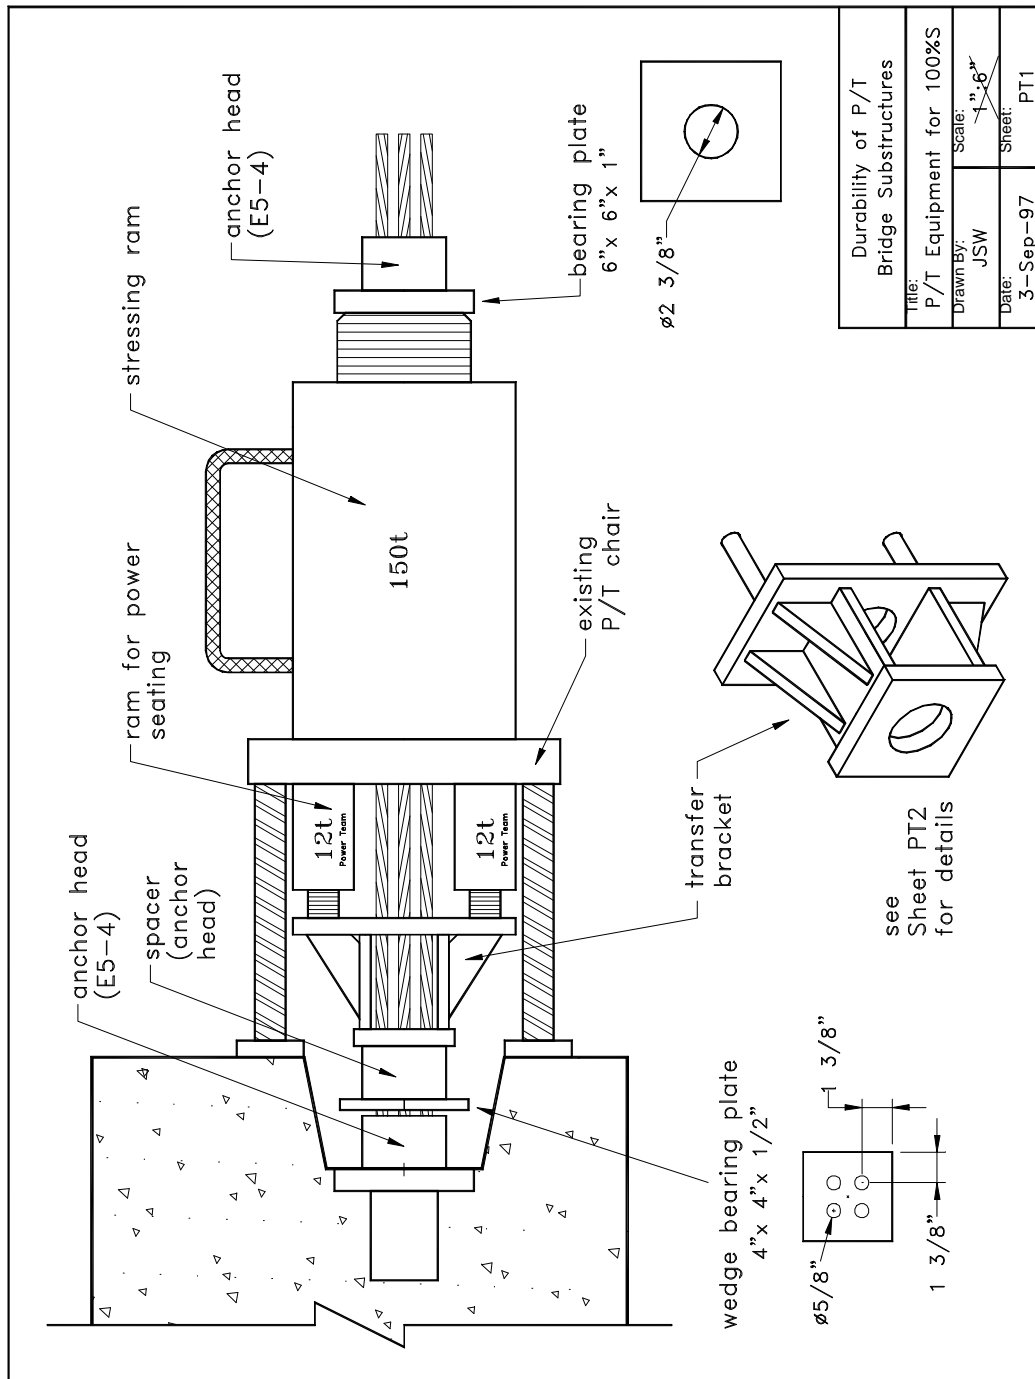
Sheet PT1: Post-Tensioning Equipment for 100%S Beams
